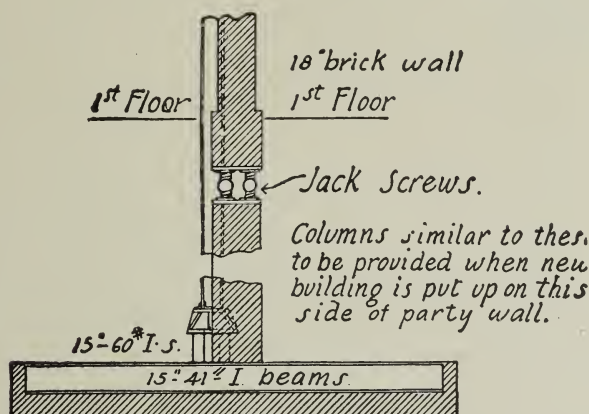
Wall and Footing, New York Life Insurance Company's Building, Chicago.
